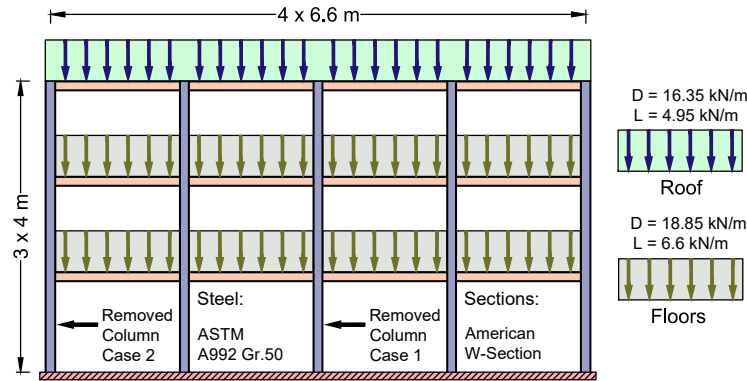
Elevation view of the three-story archetype frame and corresponding loading details
